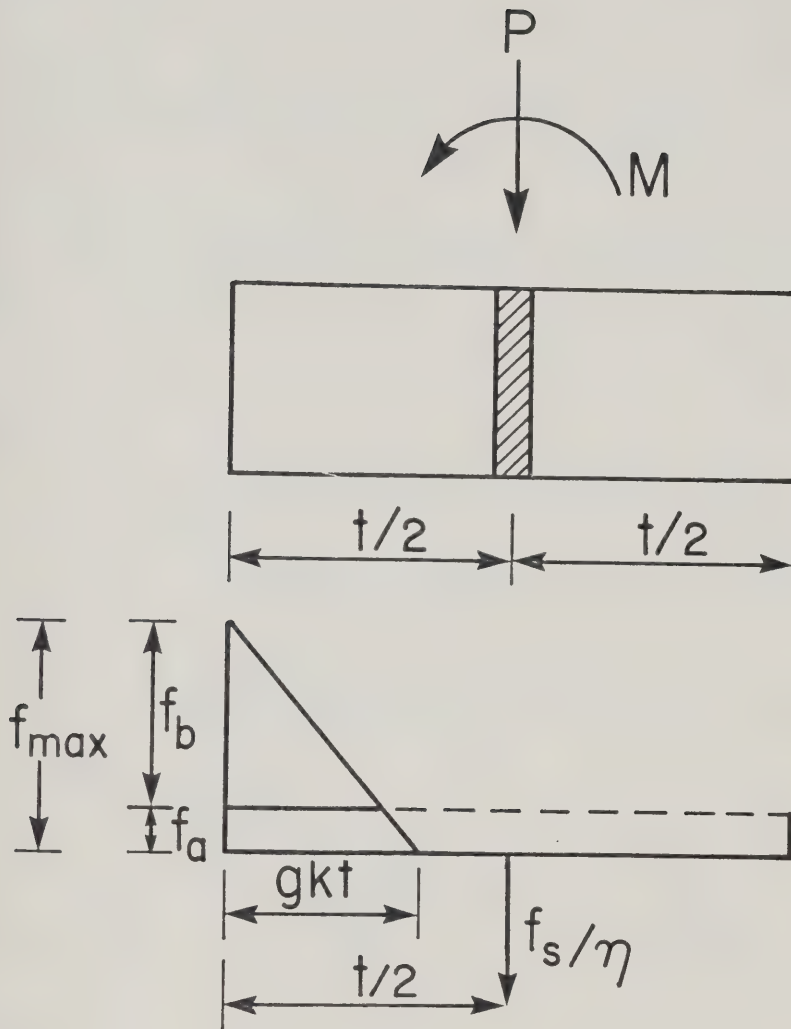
Stress Distribution for Reinforced Wall Section with Steel in Tension
